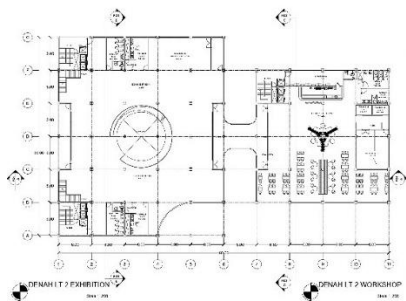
2<sup>nd</sup> Floor plan Production Building
